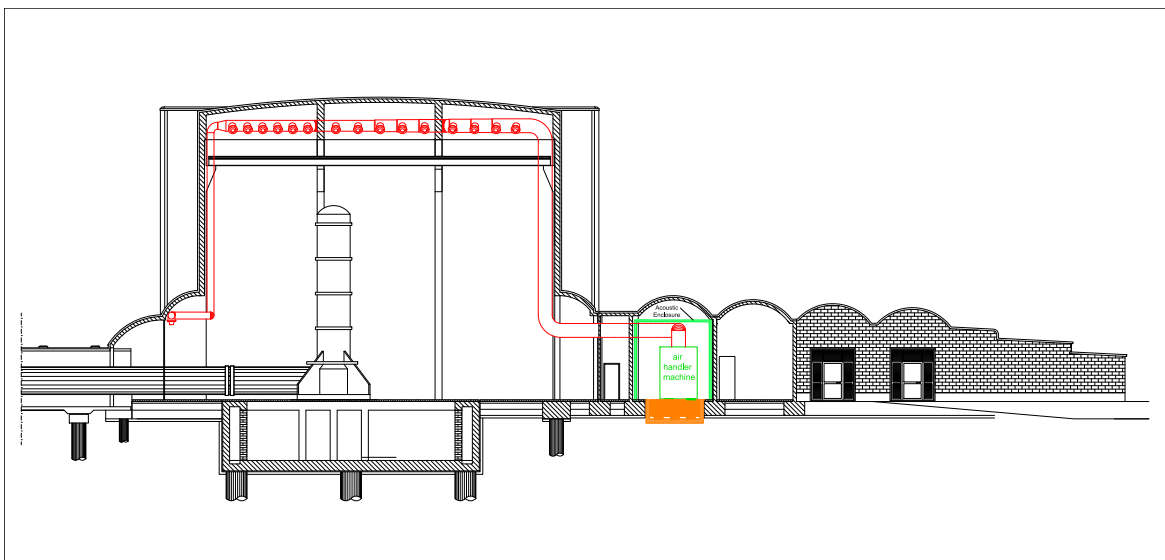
Cross section of the WEB building; experimental hall HVAC system.
